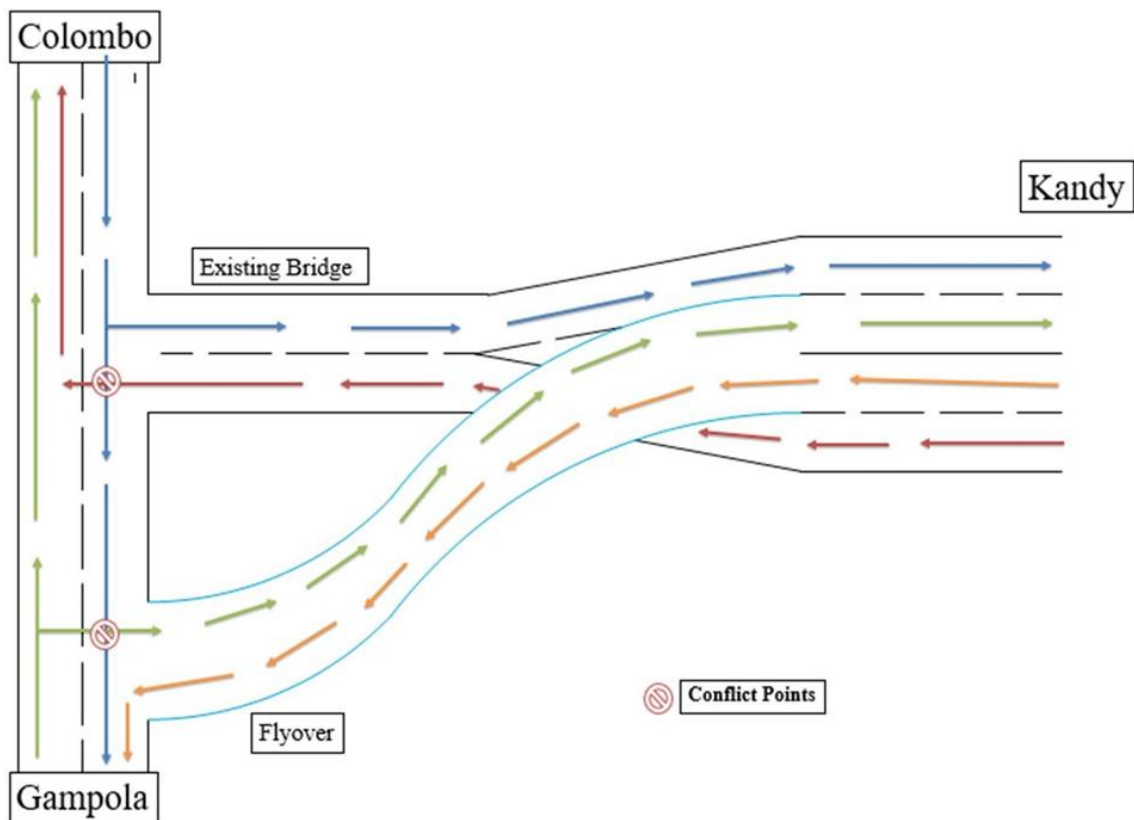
Sketch showing the new bridge, existing bridge and traffic directions in alternative 3
